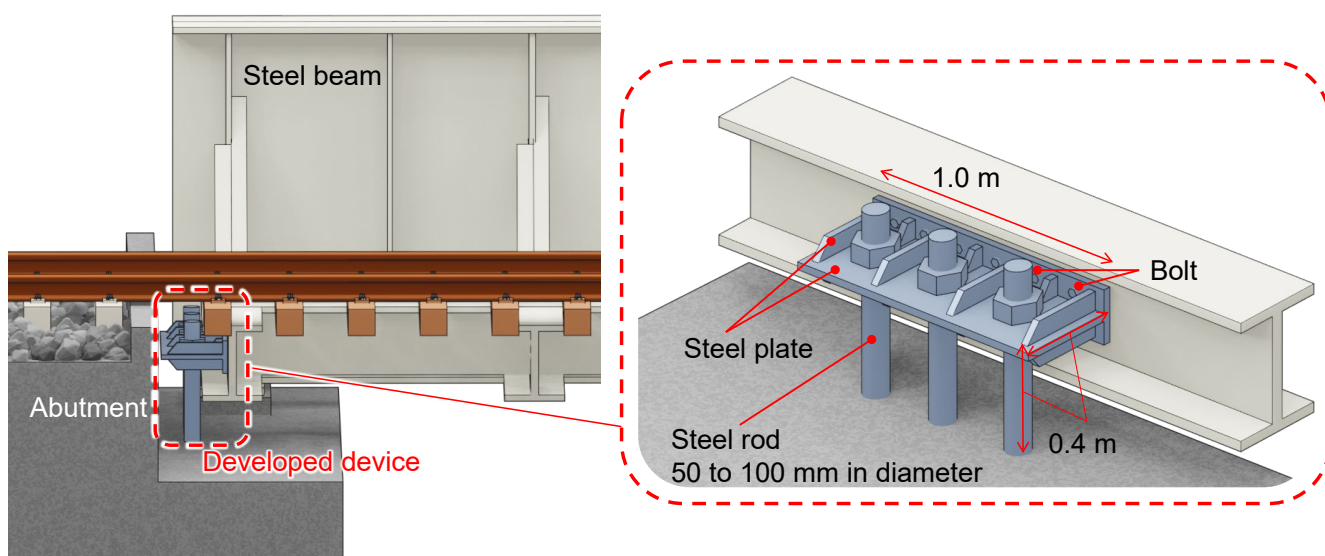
Device to prevent bridge collapse with vibration control mechanism
